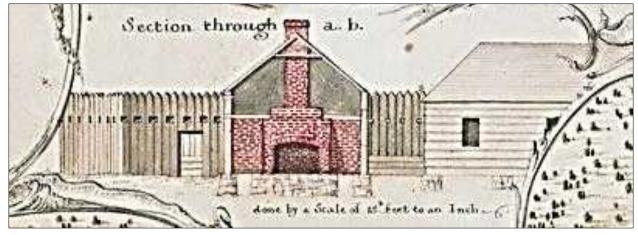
Detail of Plan of Fort Erie, *Built under the Direction of John Montressor*, *Engineer*, *1764*. By Francis Pfister, 1766 showing cross-section with stockade/palisade, sally port, stone piers, brick fireplace and chimney, and squared timber construction.
